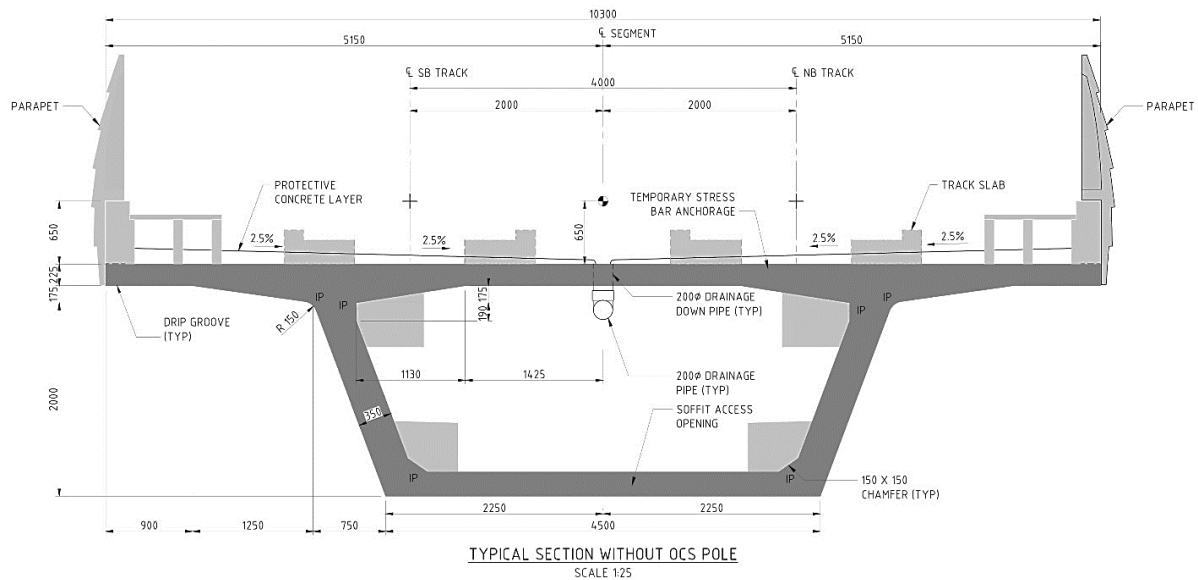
Cross Section of Precast Segmental Box Girder Deck.
